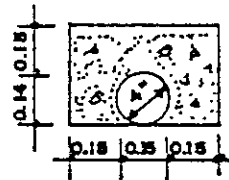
DETAIL OF HOUSE CONNECTION WHEN SEWER IS 2.0 M. DEEP OR MORE
